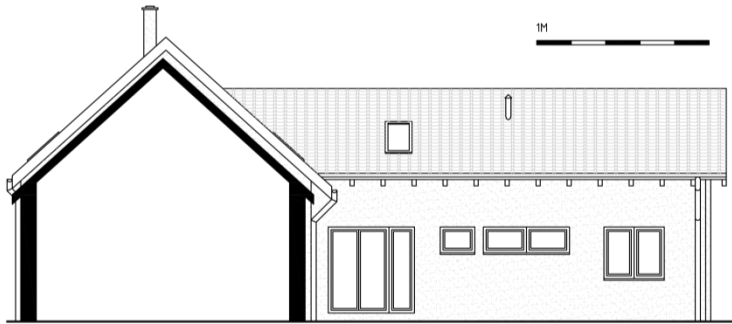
Southern elevation of the new Přebice 442 single-family house. Black hatching indicates neighbouring building.
